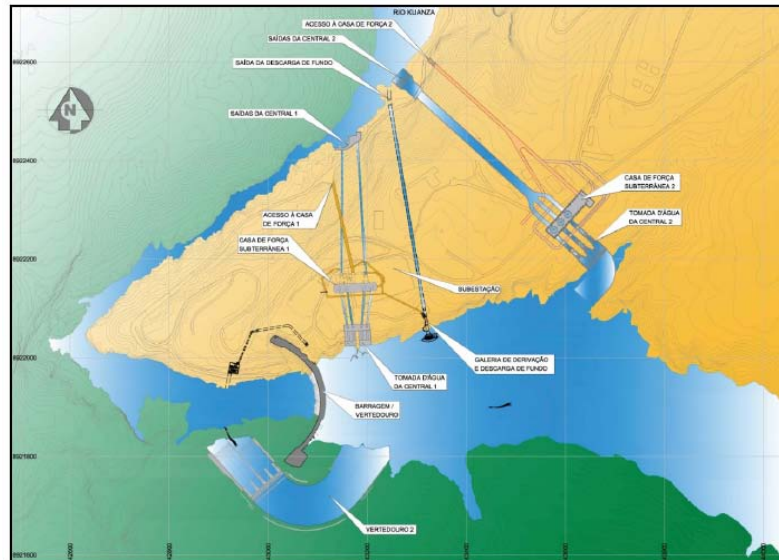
General plan of the existing structures and of those to be built at Cambambe AH.
